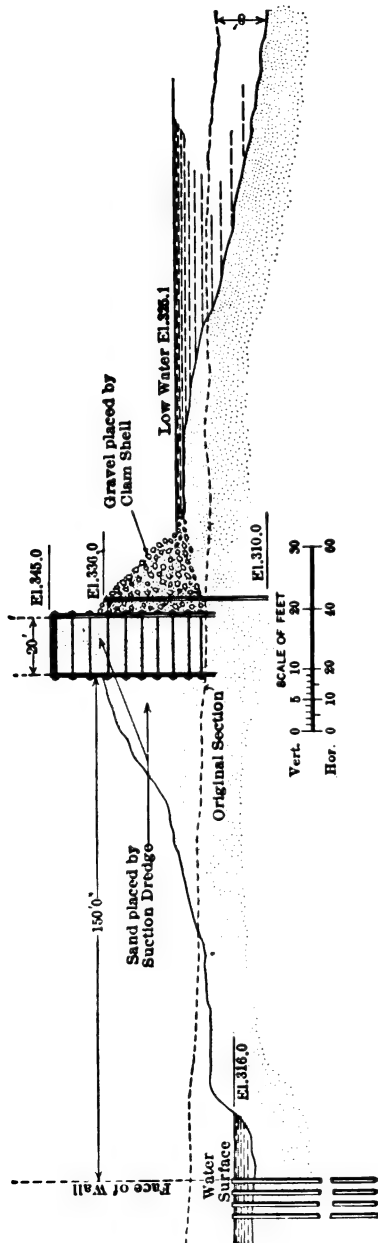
TYPICAL SECTION OF COMPLETED COFFER-DAM. DAM No. 48.
